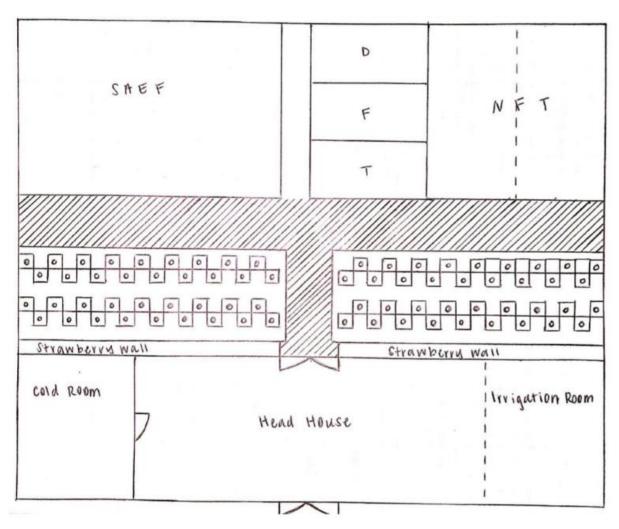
Entire layout of Tri Cycle's Hydro House including planned secondary phase's head house (Gould, 2019)
